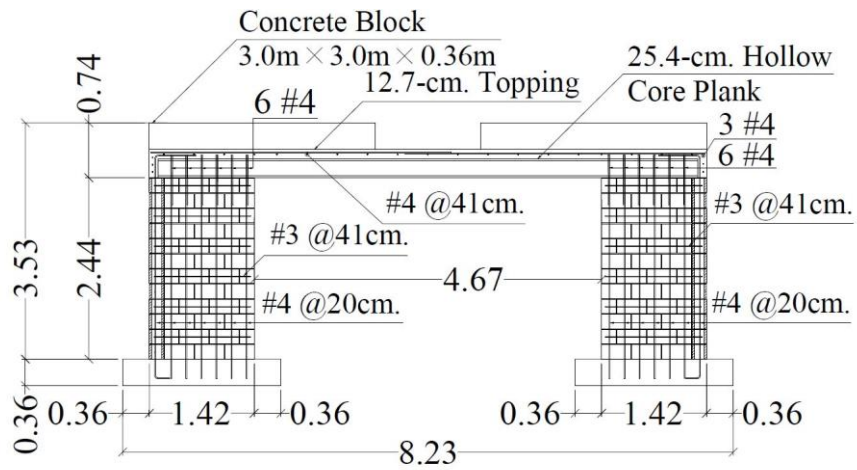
and 5-3 shows the reinforcement details for the two specimens. The reinforcing bars in the walls had a nominal yield strength of 414 MPa (Grade 60 in ASTM Standard²⁴). Each T-wall had six No. 4 (13 mm) vertical bars spaced at 20 cm (8 in) on center in the web, and three No. 4 (13 mm) vertical bars spaced at 41 cm (16 in) in the flange. The horizontal bars in the web and the flange were No. 3's (10 mm) spaced at 41 cm (16 in) on center. In Specimen 2, each of the out-of-plane walls had No. 4 (13 mm) bars
